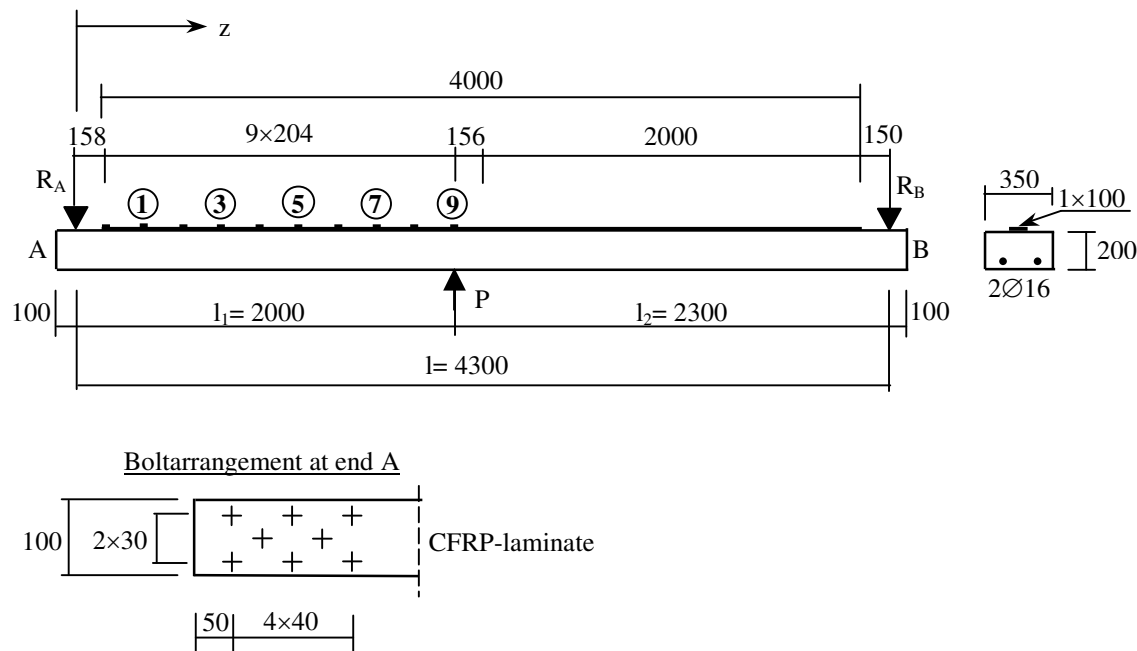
Test specimen with placement of load P , CFRP-laminate and strain gauges shown. Bolts at end B (right end) are not shown.
